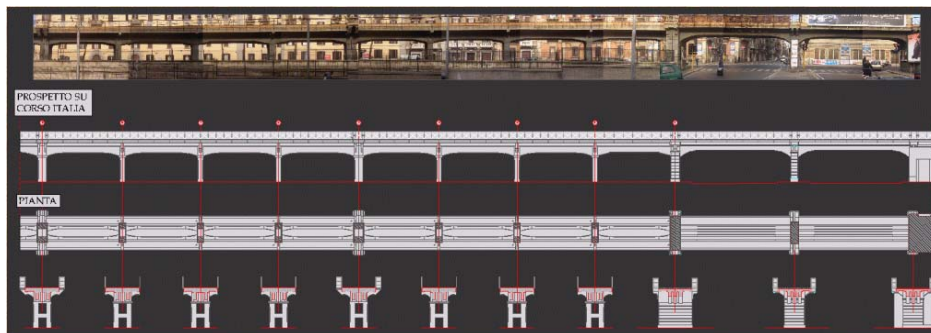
Views and drawings of the Railway Viaduct in Bari.
